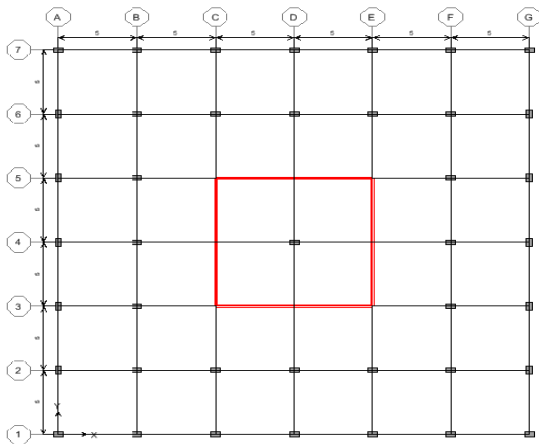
Model 4: Regular Building with Shear Wall at Position 3 (center)
